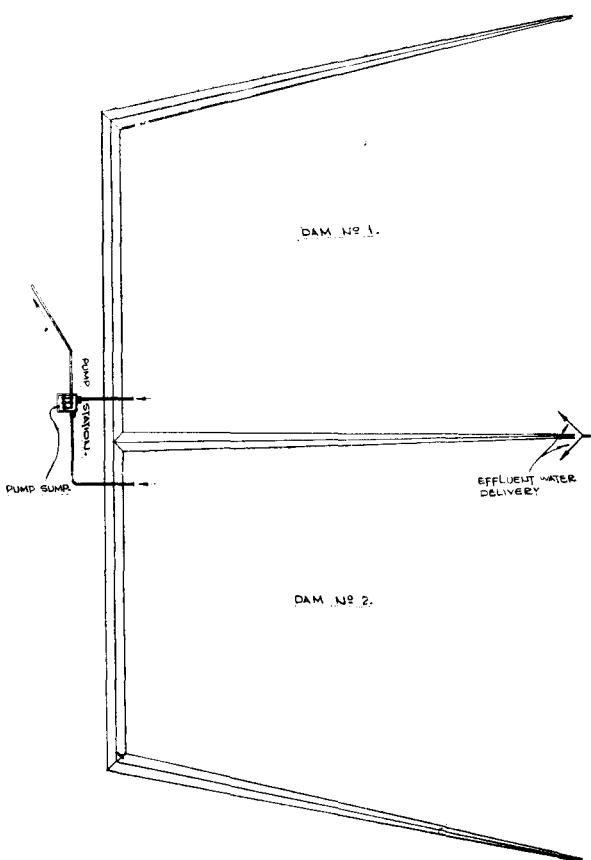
Plan of catchment-water dam—two sections to facilitate desludging
